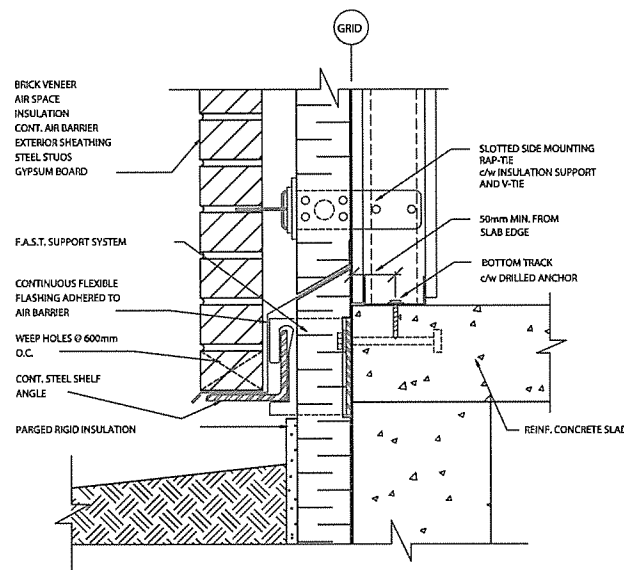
Alternate Brick Veneer / Concrete Block Detail at Foundation
